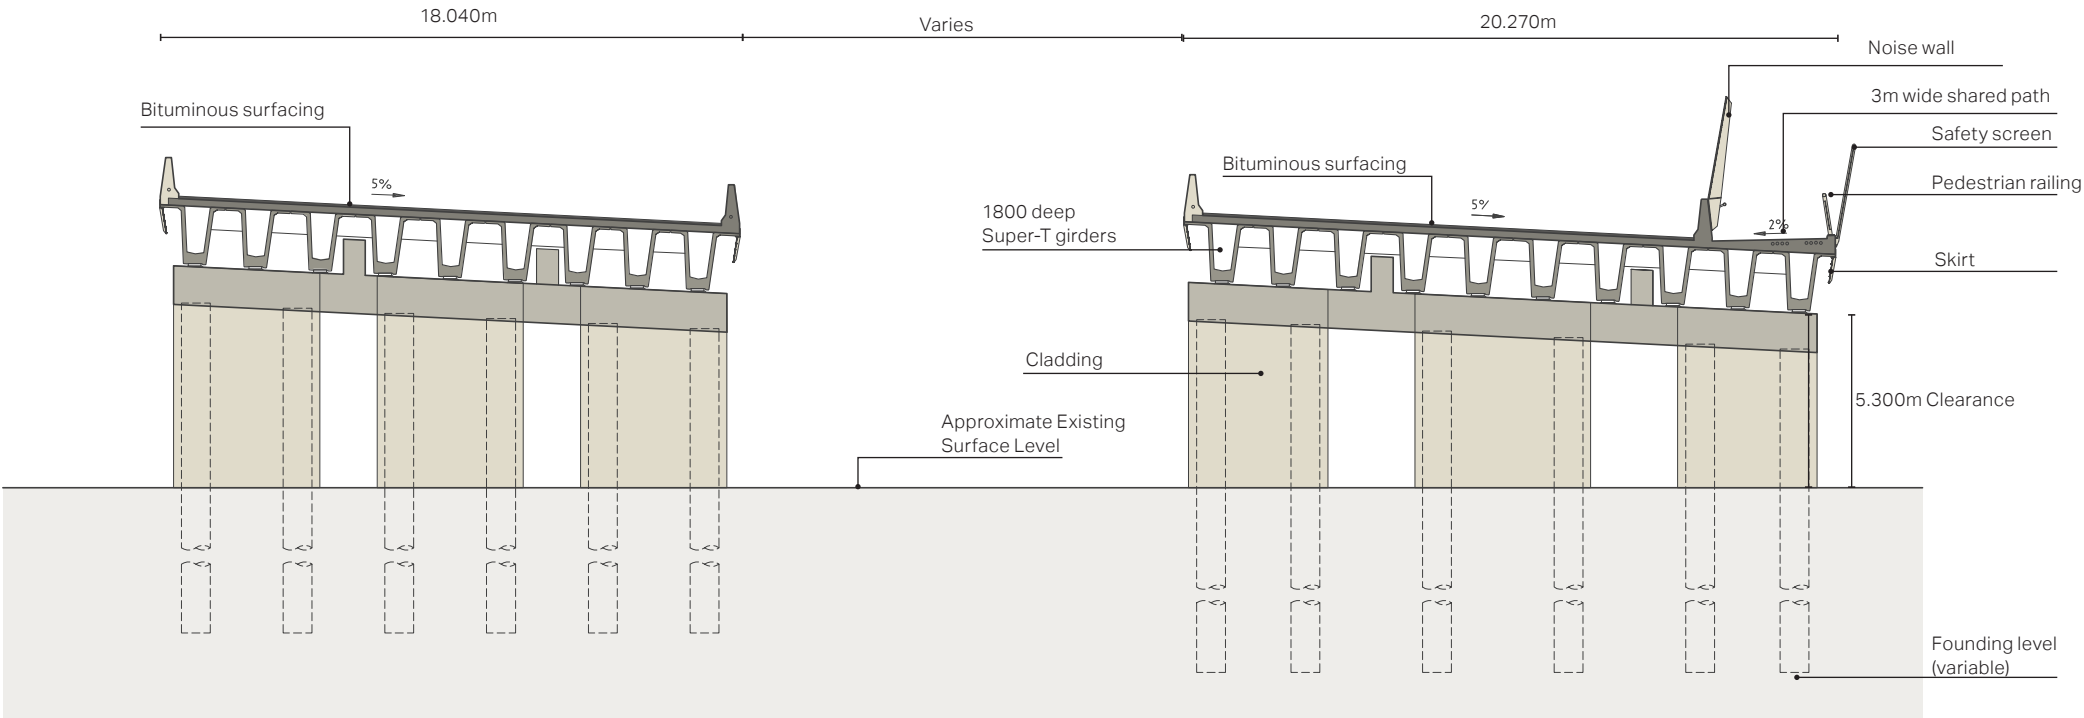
Typical Bridge Cross Section - sourced from 'As Built' drawing
